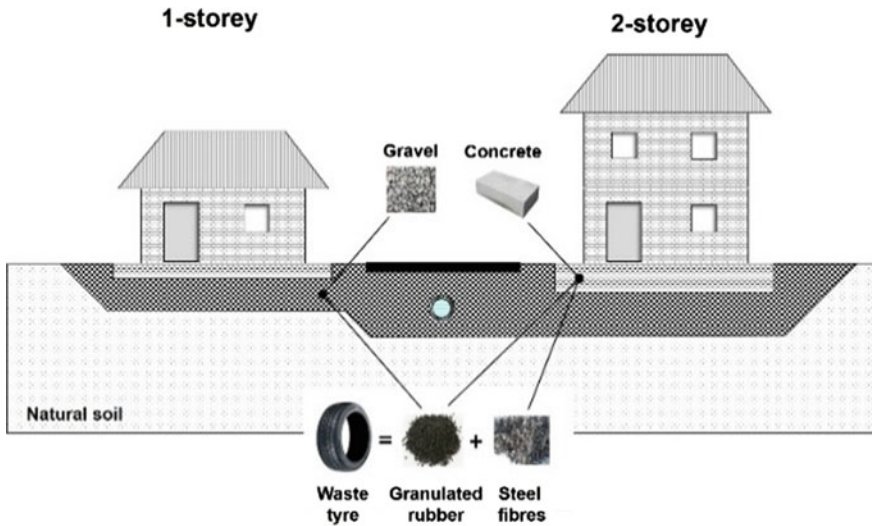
Proposed ERGSI foundation system for residential buildings in New Zealand
